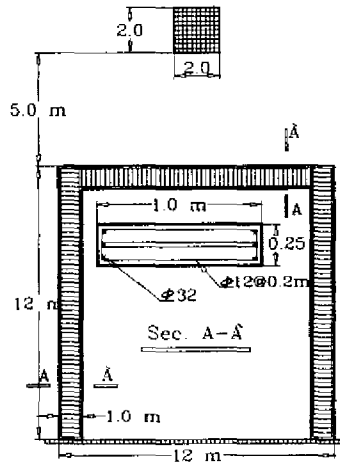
Shape, dimension and reinforcement details of an RC frame and a falling block
